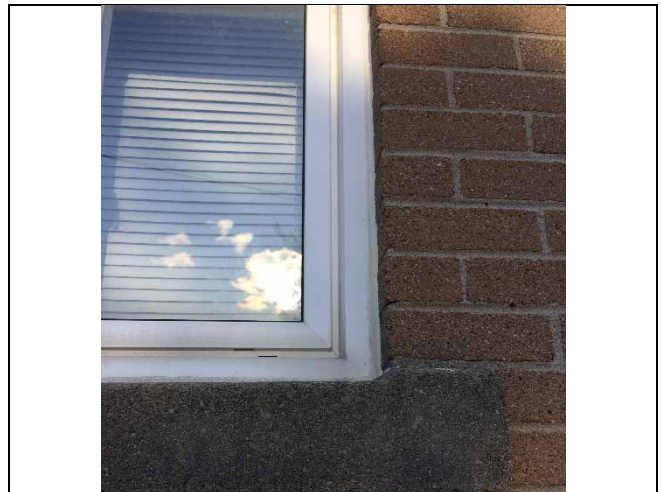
Presumed asbestos-containing exterior window caulking – white and brick mortar of 116 Brighton Crescent.
